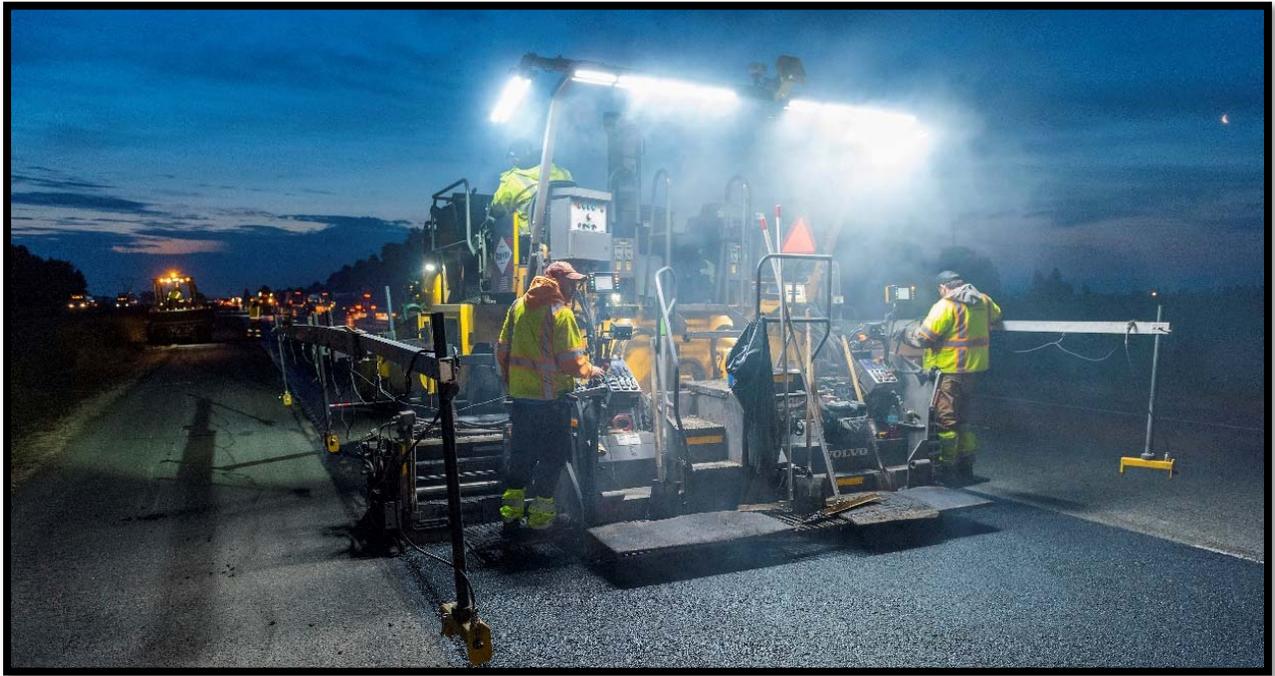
Paver outfitted with flashing Blue strobes above work lights (hard to see).
